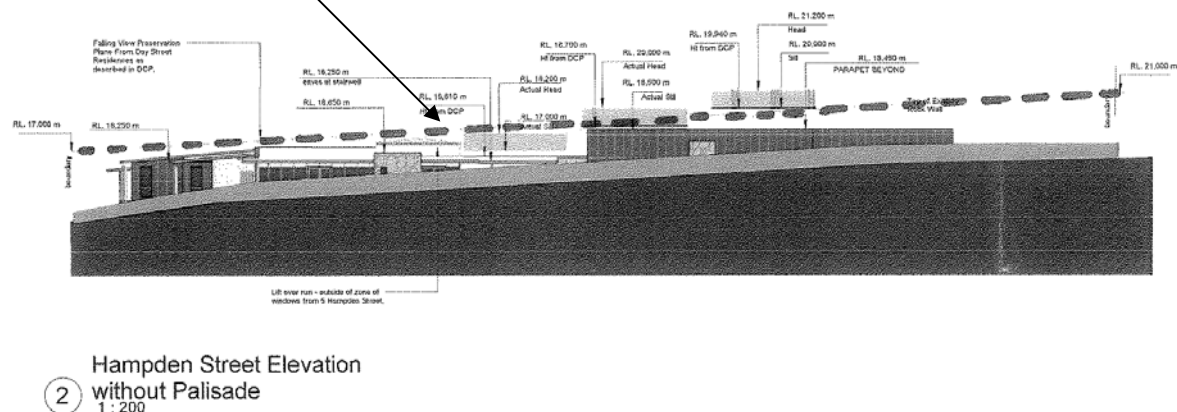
Architectural plan indicating that the proposed development is located below the view preservation plane established for the Day Street dwelling houses.
